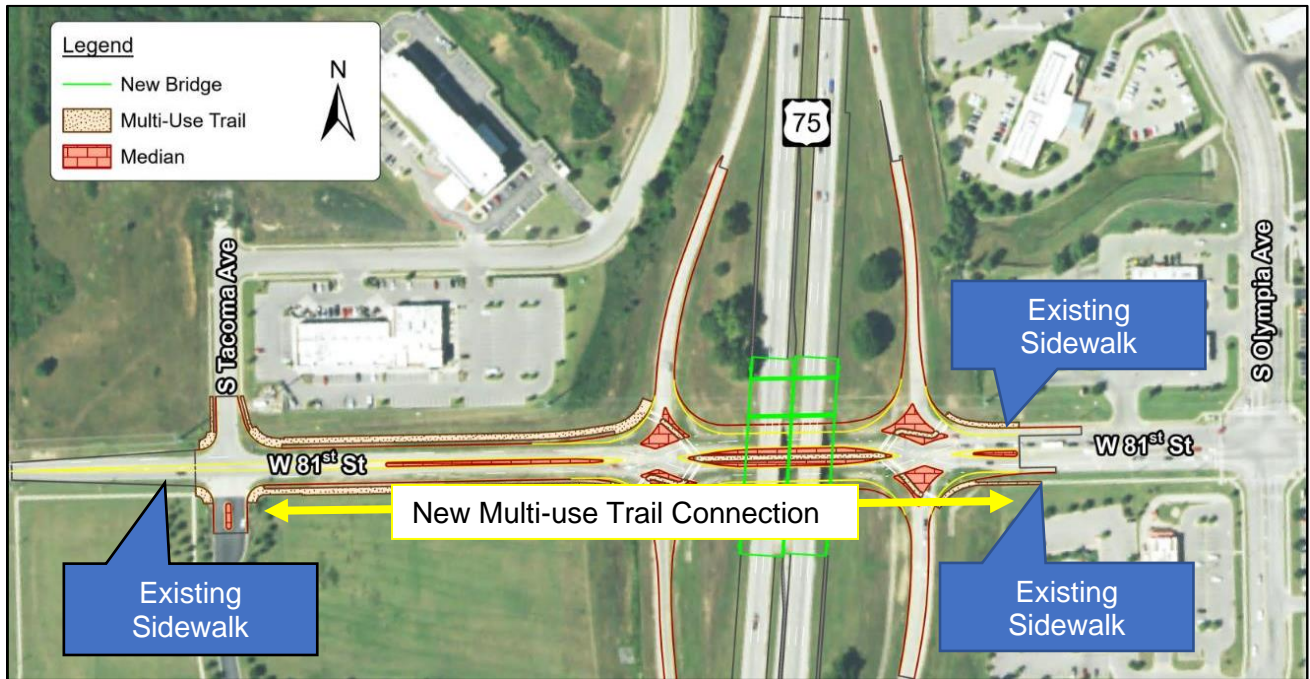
Proposed Connection of Existing Sidewalks on W. 81st Street
